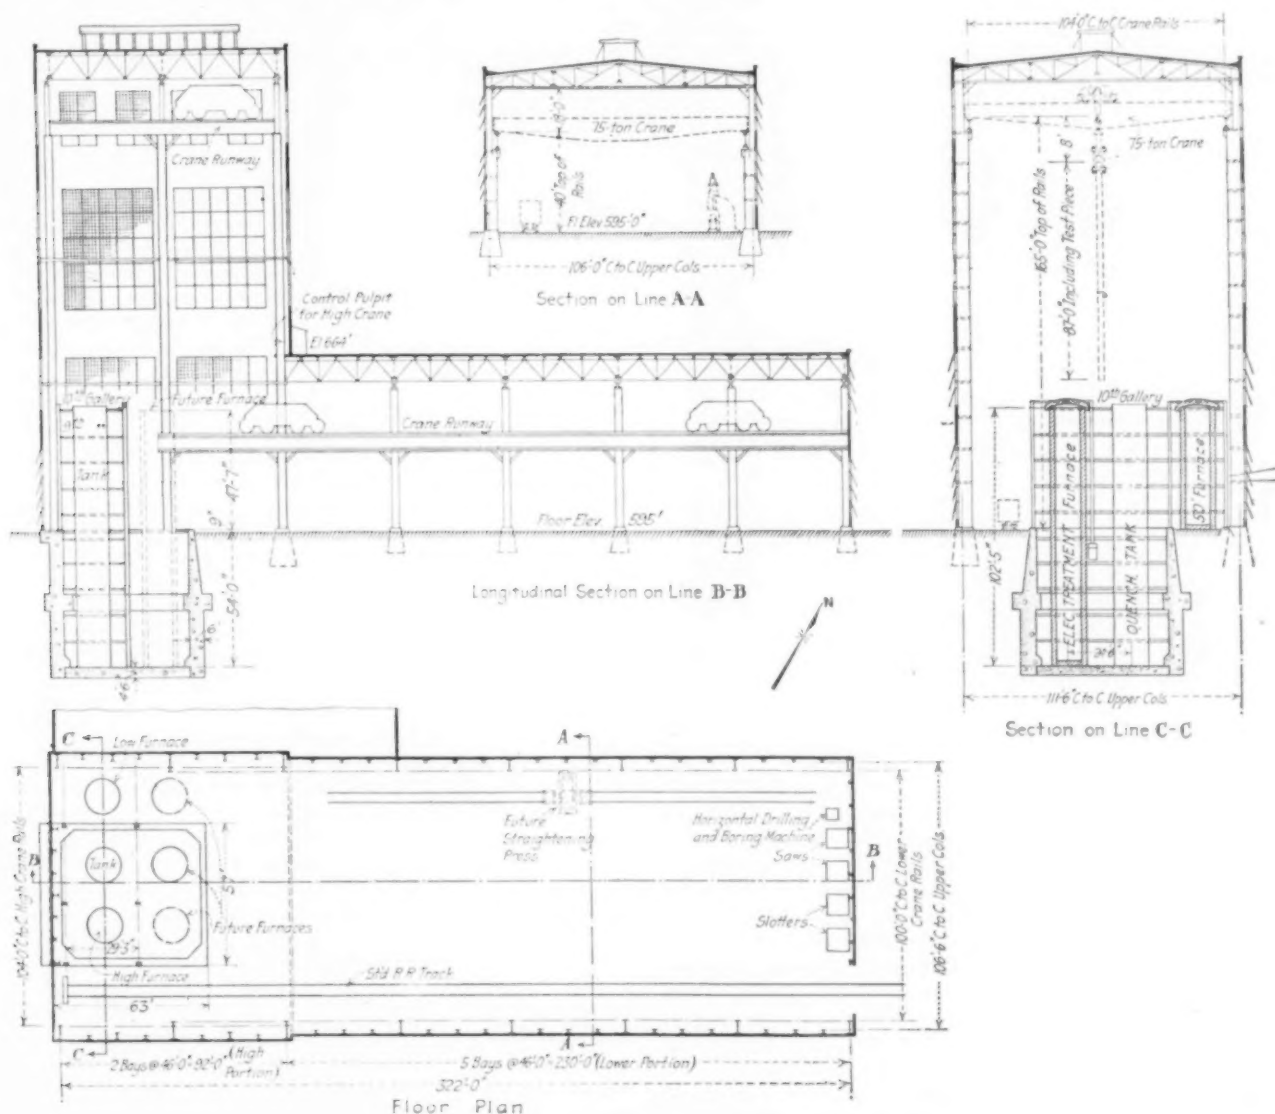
GUN-TREATMENT BUILDING, PLAN AND SECTIONS
